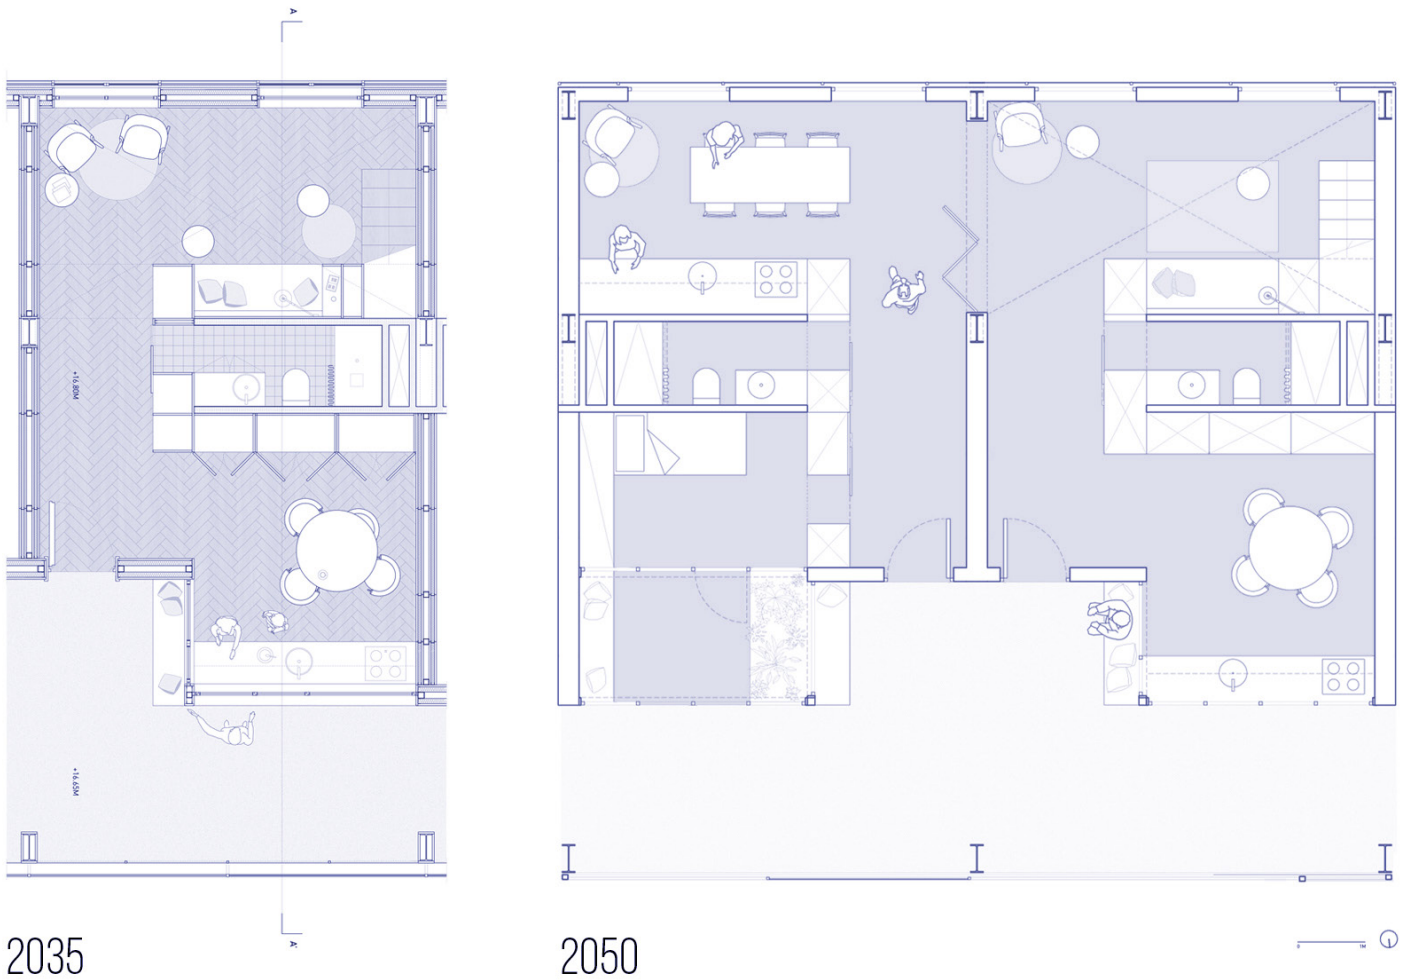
Robin Hood building. Lower and upper-level plans of new dwelling.
